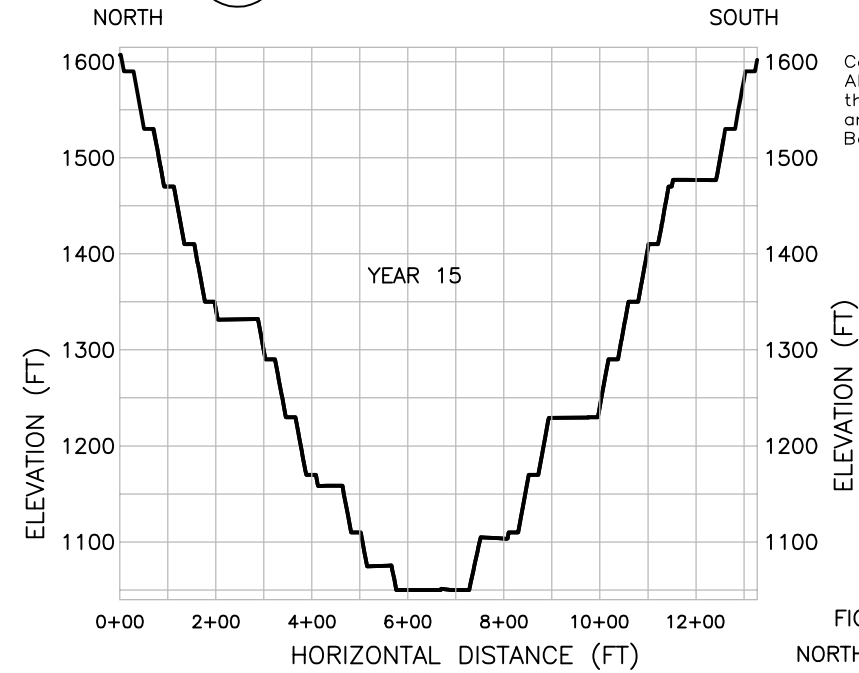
to 3.1-7 2 SECTION: WEST PIT
